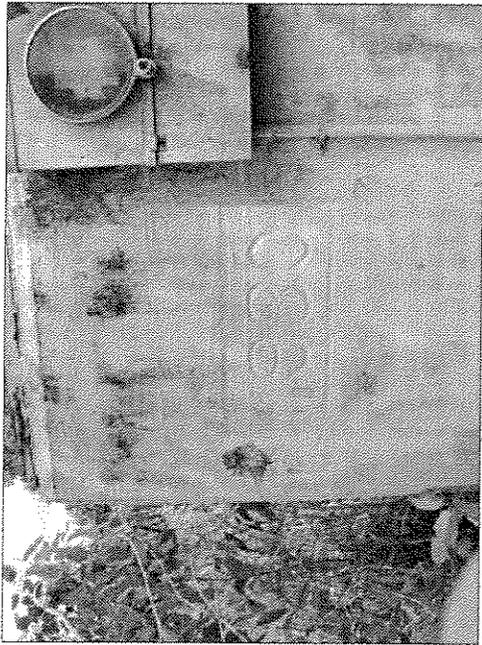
Site-3940 Southeast Corner Showing Construction Date.
